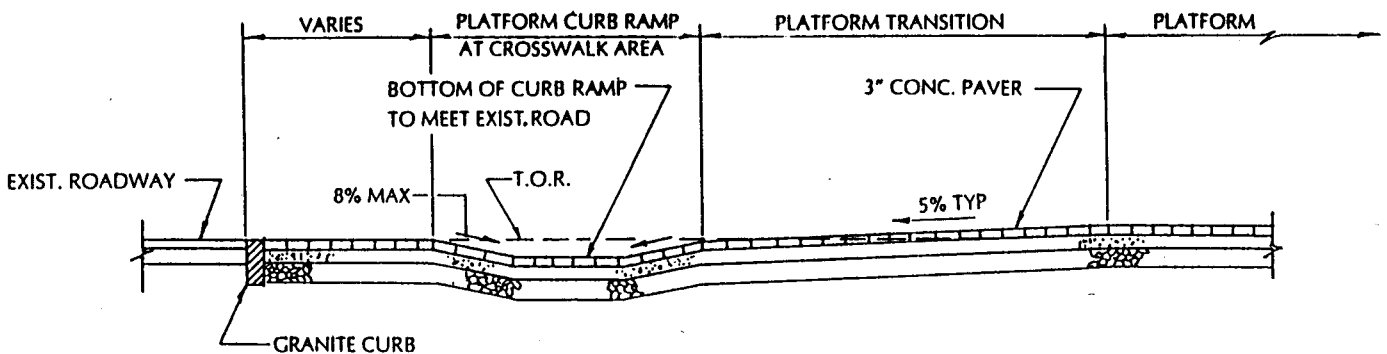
Typical Longitudinal Platform End/Section at Crossing Area (F)
